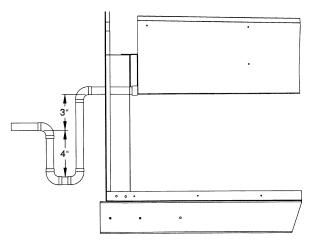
Condensate Drain Connections (Typical Roof Curb or Slab Mount Shown)
